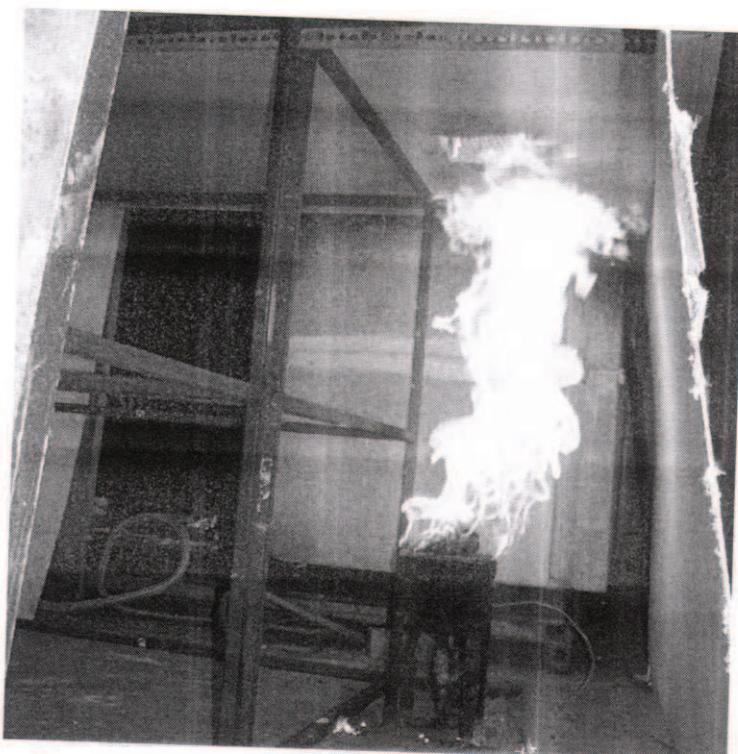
Ceiling test – after 1 minute (burner at 100 kW)
